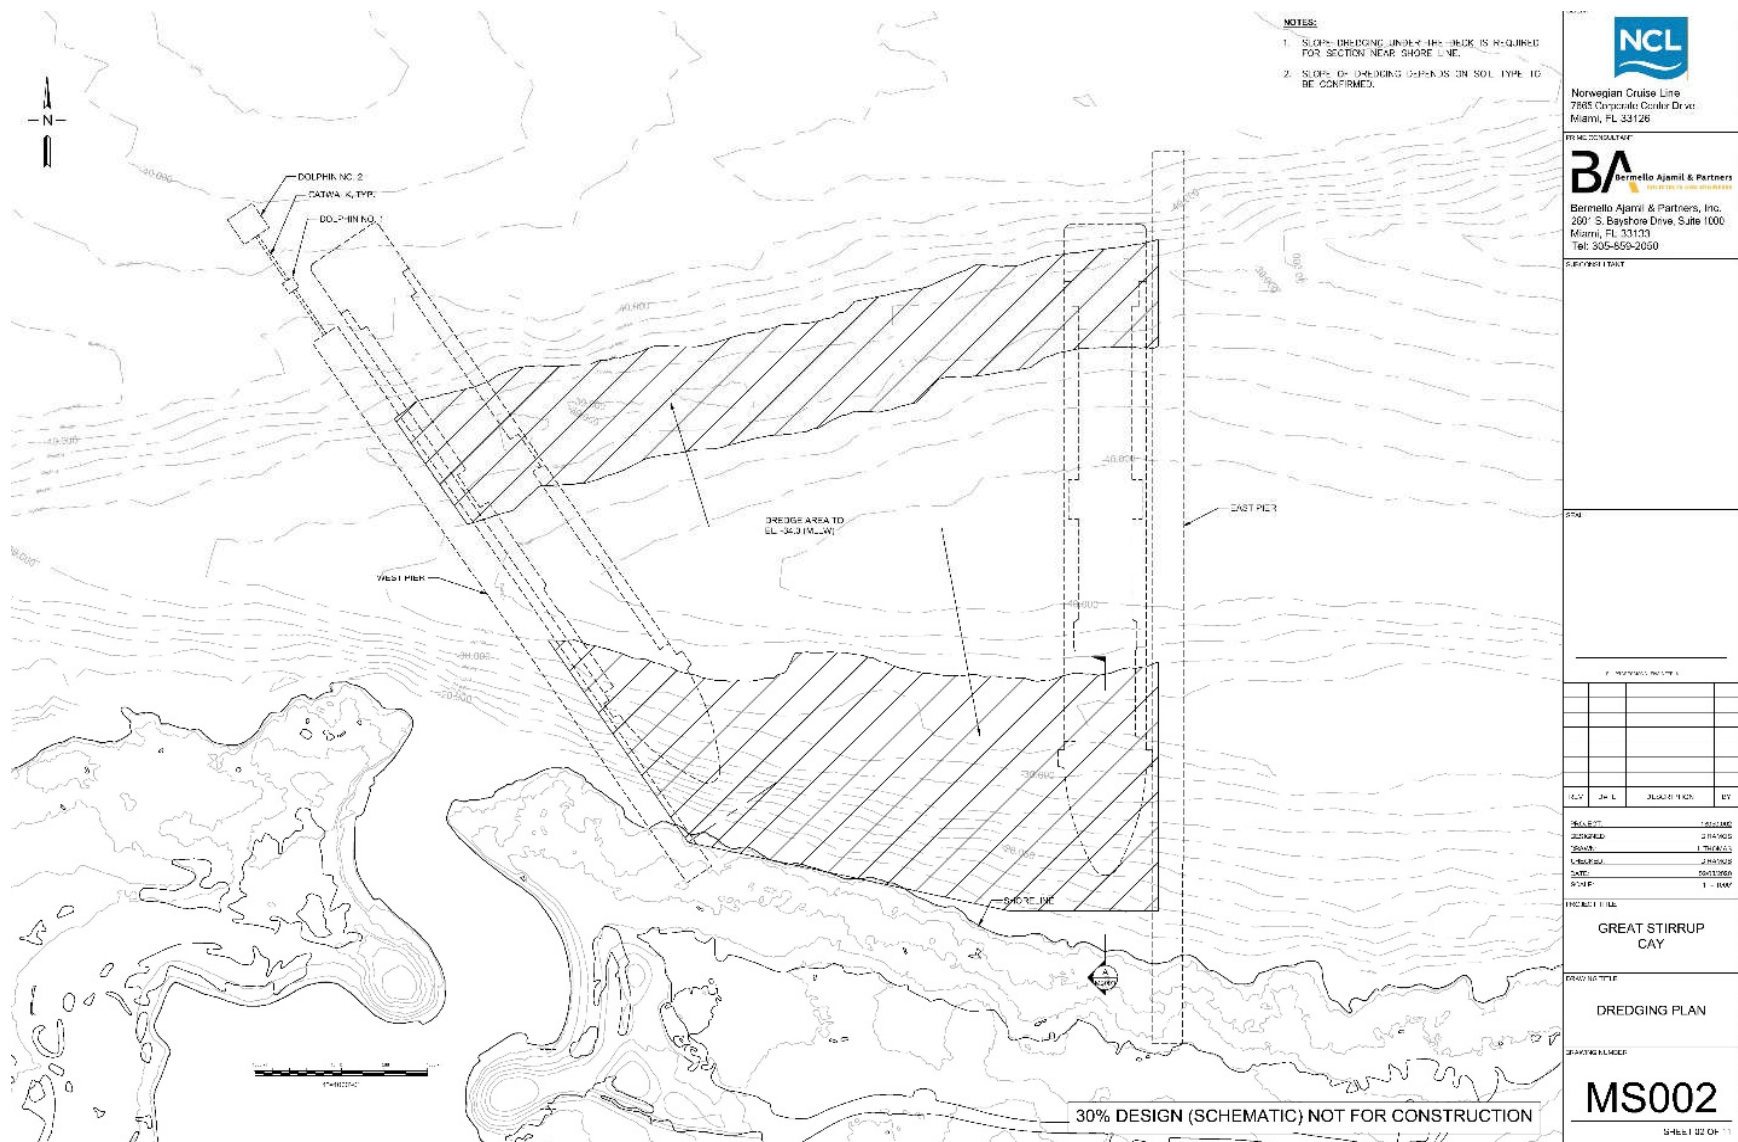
Proposed dredging plan for the cruise ship piers on GSC
